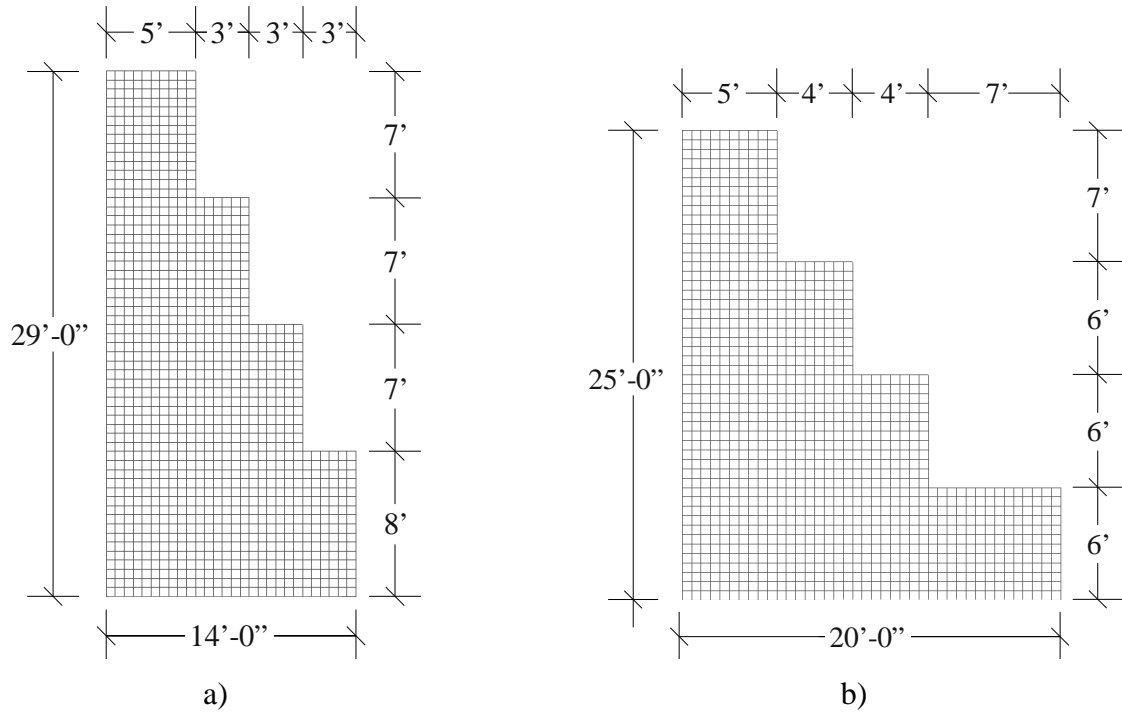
Cross-sections of concrete portions of finite element models:
